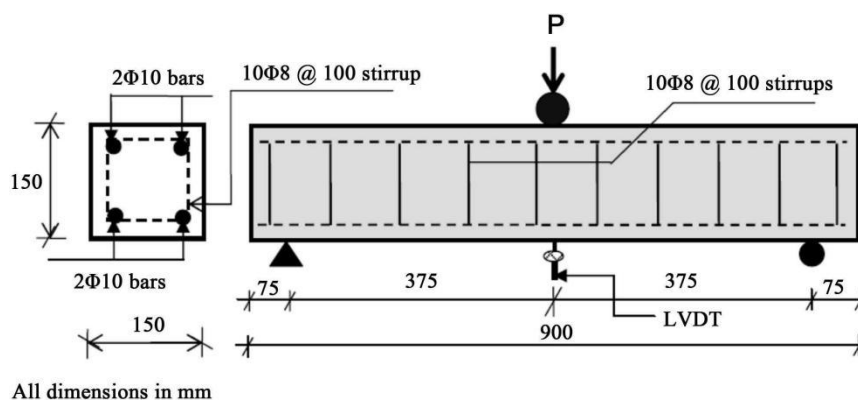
Flexural test setup of RC beams indicating geometric and reinforcement details.
